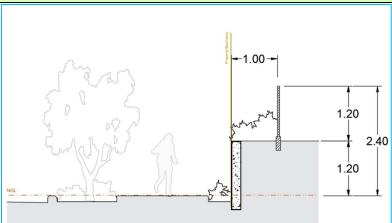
(di) Retaining wall and fence height - one step
